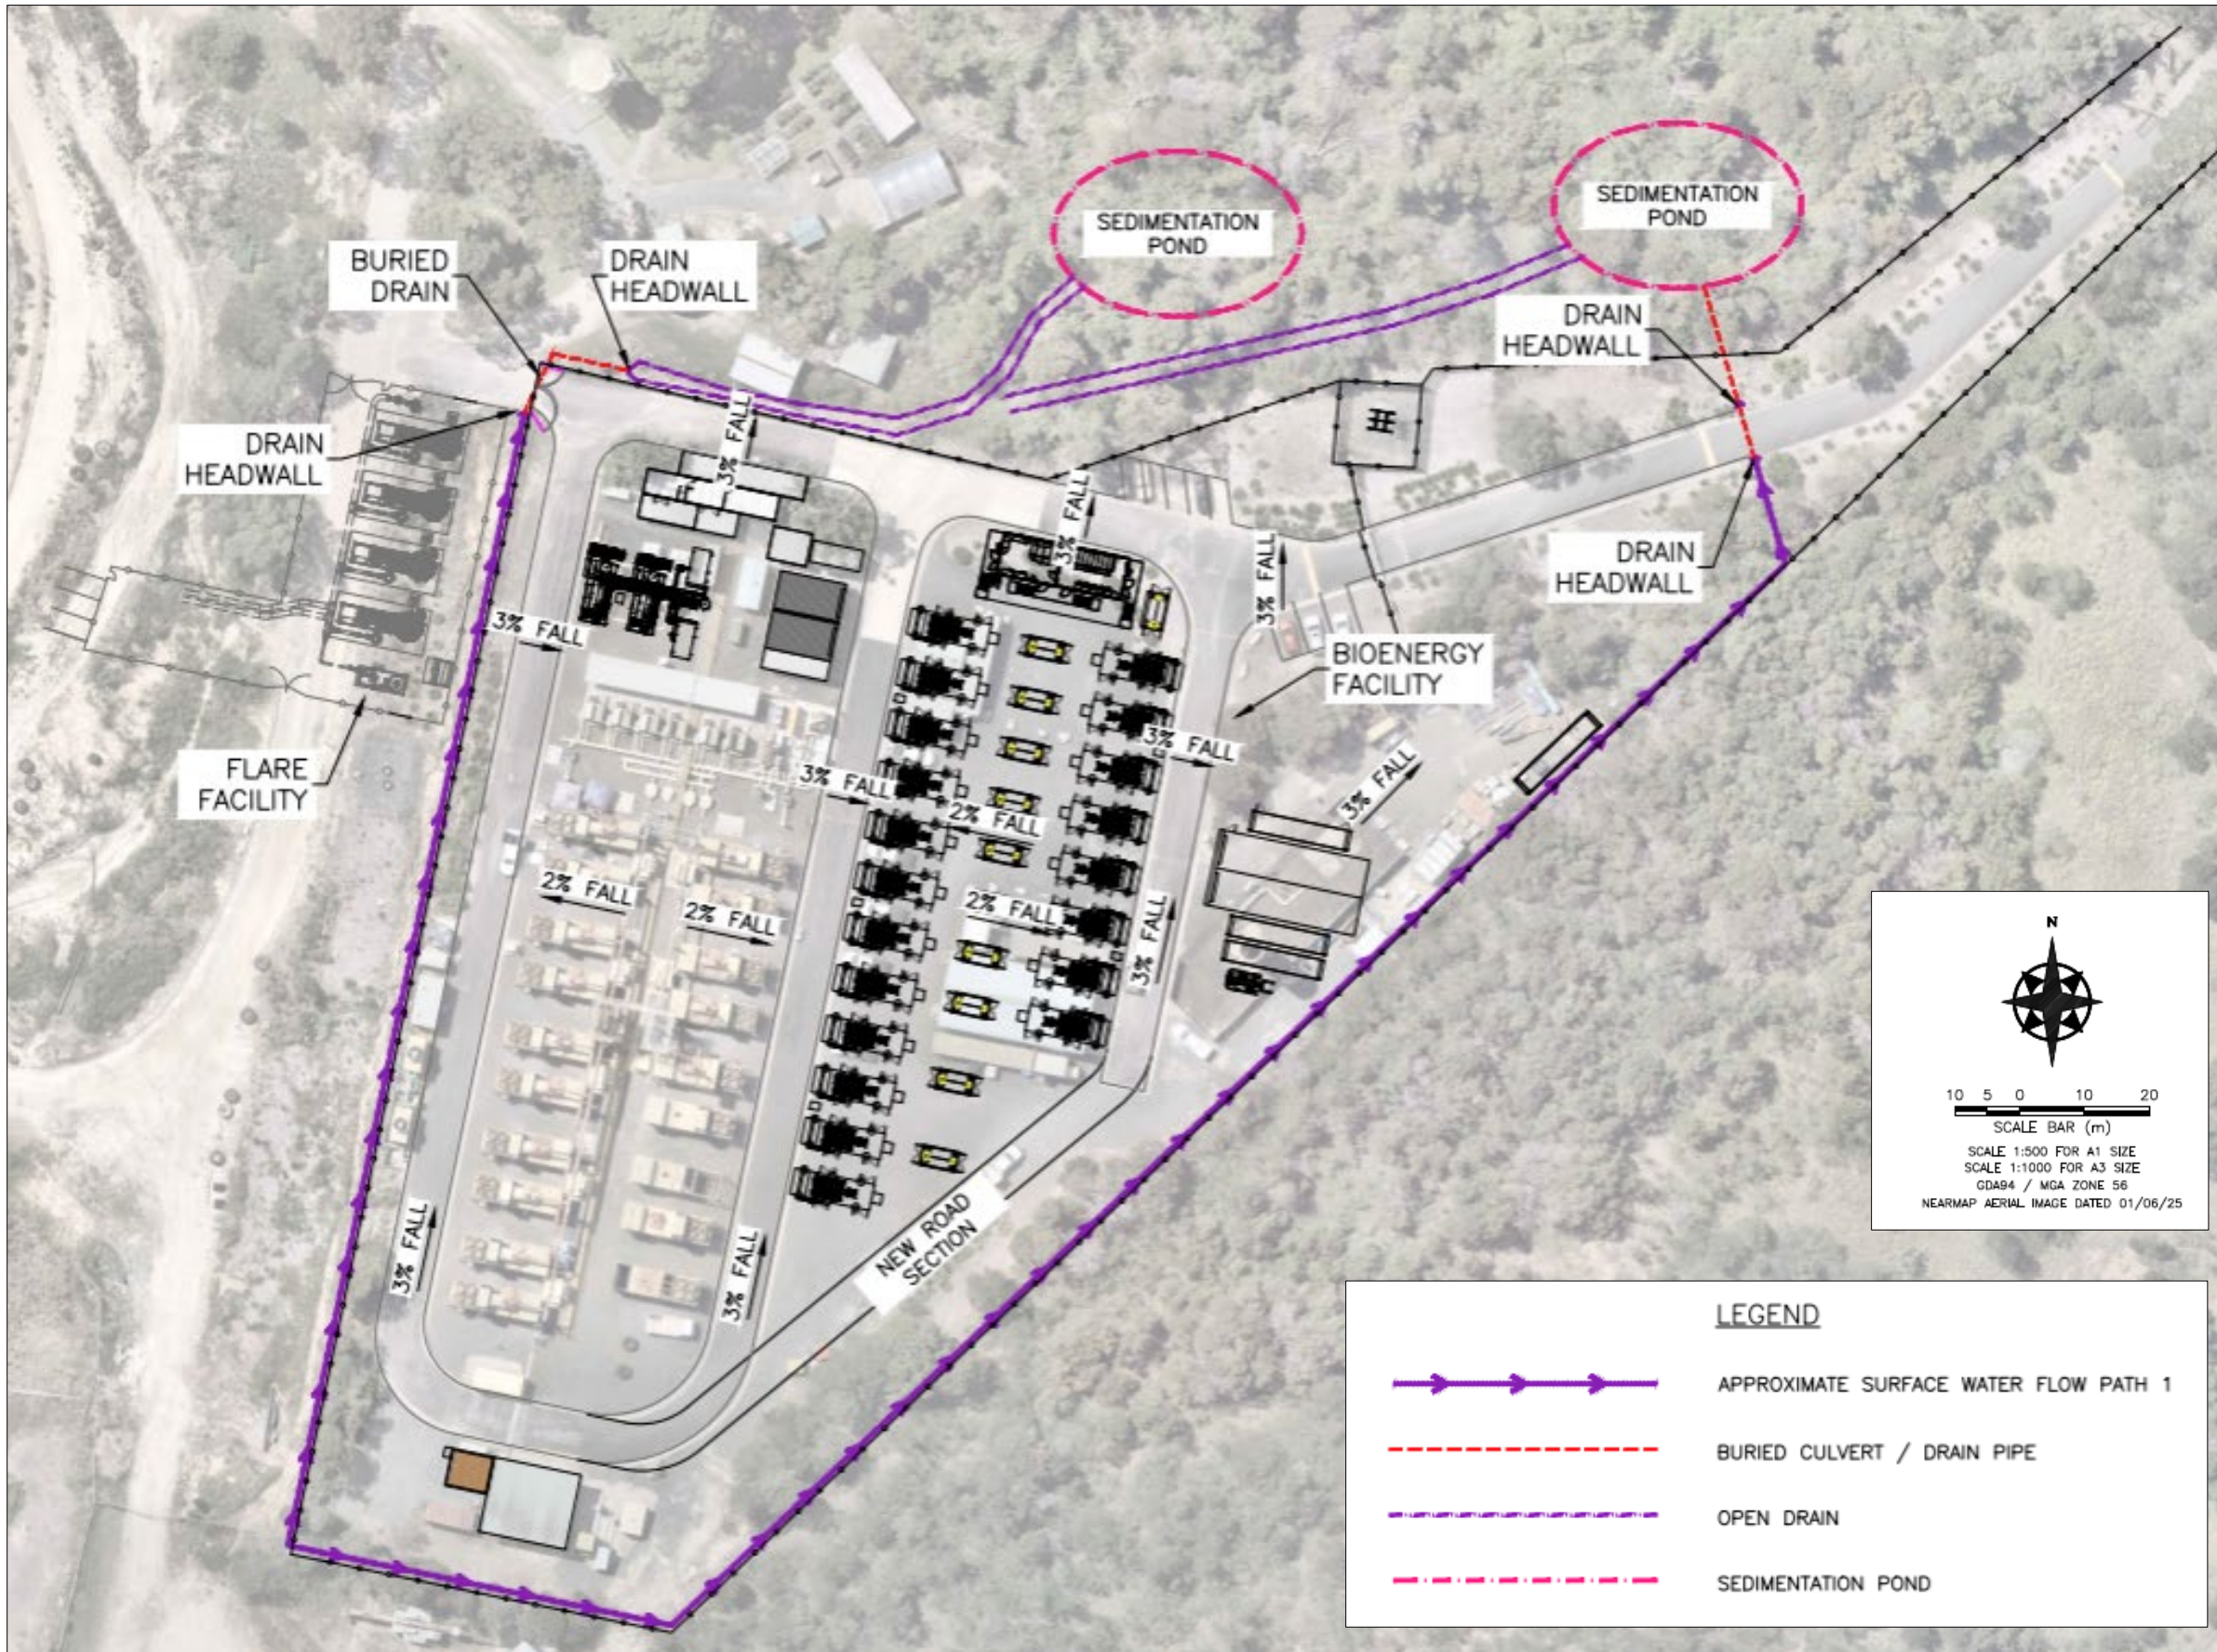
Existing site stormwater layout (LMS Energy, 2025)
